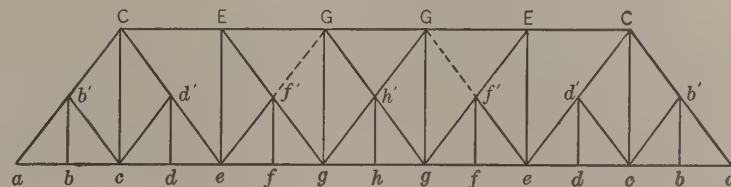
(c). Subdivided Pratt Truss, or Baltimore Truss. (See photograph, page 100.)
